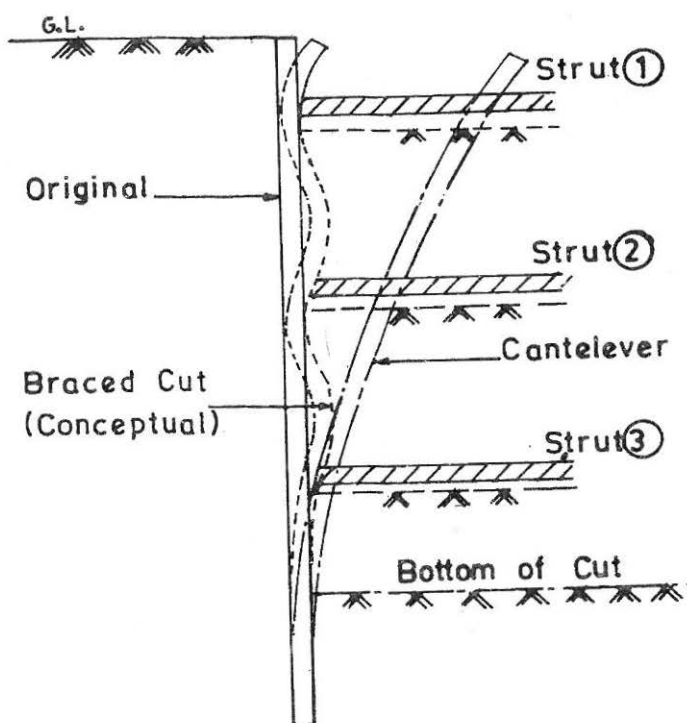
Wall Deflection in Sequential Excavation and Strutting (Conceptual)
